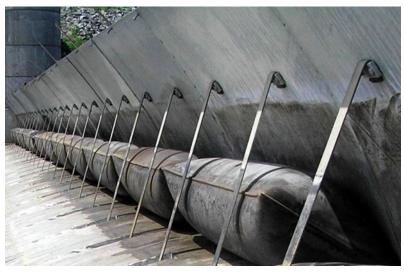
Typical steel rubber gate, Saylorville Lake Dam, Iowa
